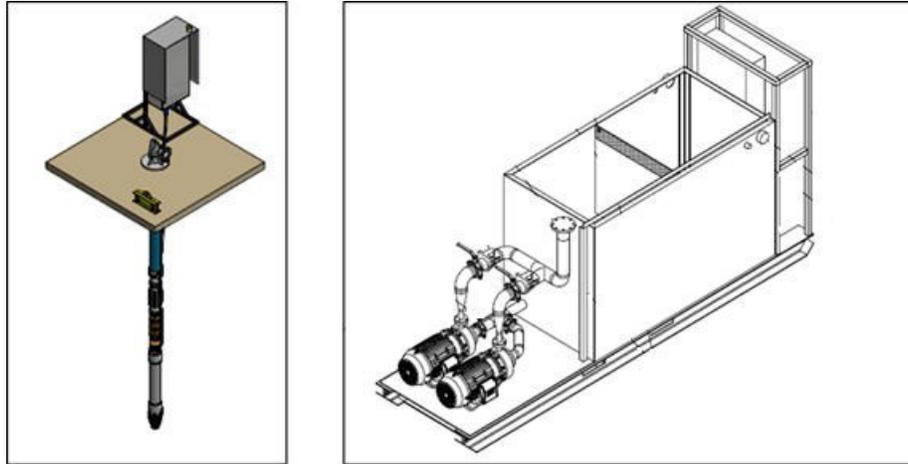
TechnoSub proposed solution for flooded workings – Deepwell pump (left) and U/G pump station (right)
